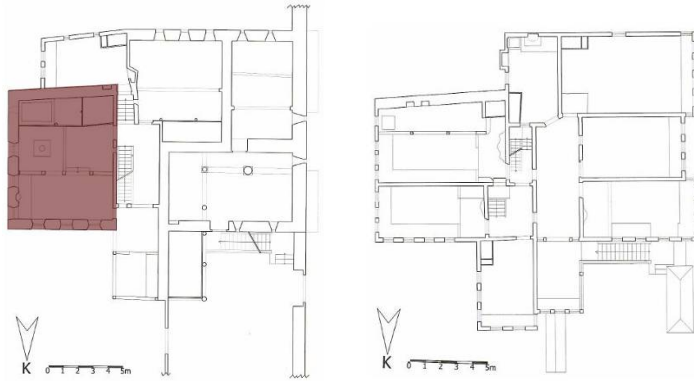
Mühürdarzade House-Ground and First Floor Plan-Toyhane is highlighted (Ünlüdil, 2005)
